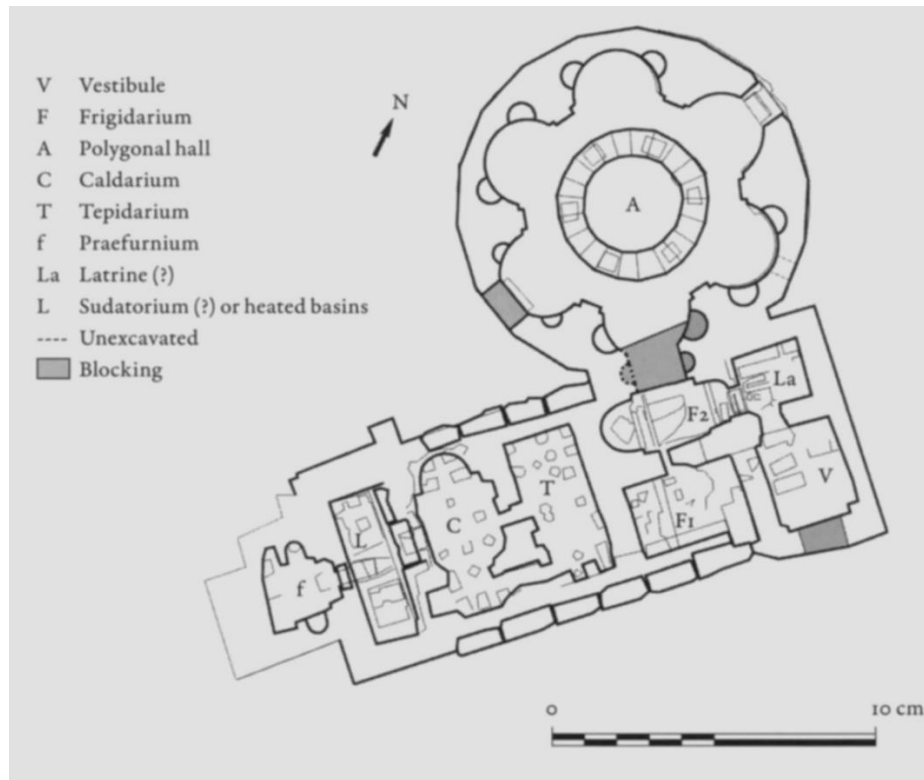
Plan of the Bathhouse. (After Lightfoot C and M. 2007, p.129).
